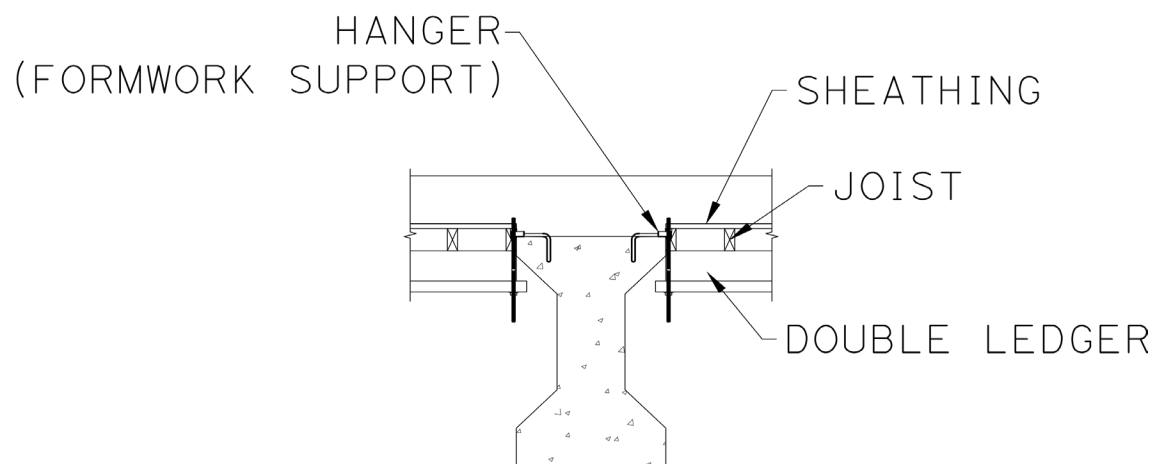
Precast Concrete Girder Deck Formwork Detail
